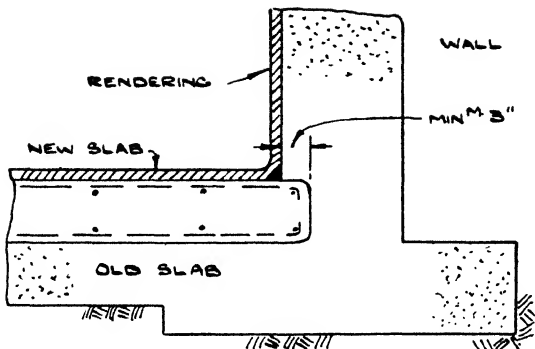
PROVISION OF NEW RAFT TO EXISTING BASEMENT
